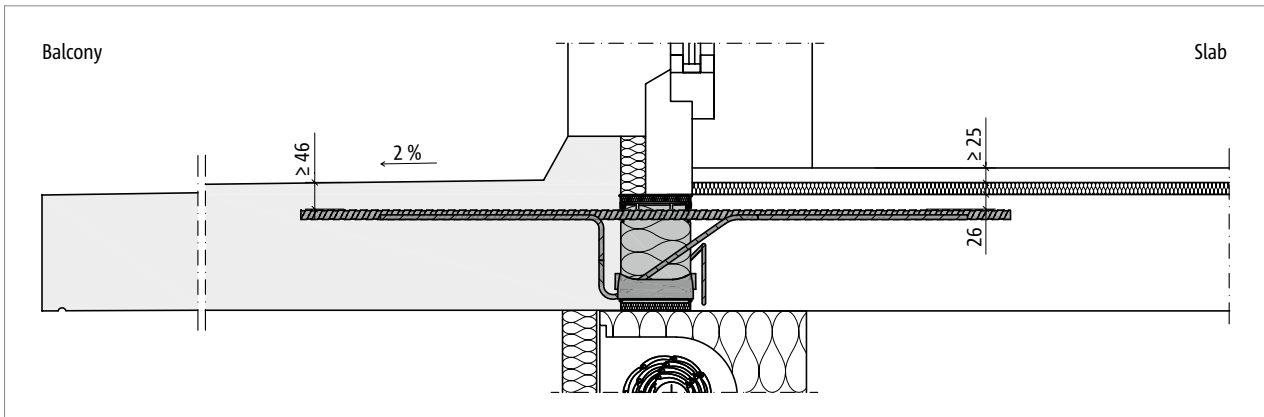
Schöck Isokorb® CXT type K-E-REI120: Precast unit with higher concrete cover and flooring material inside for fire protection class REI 60
